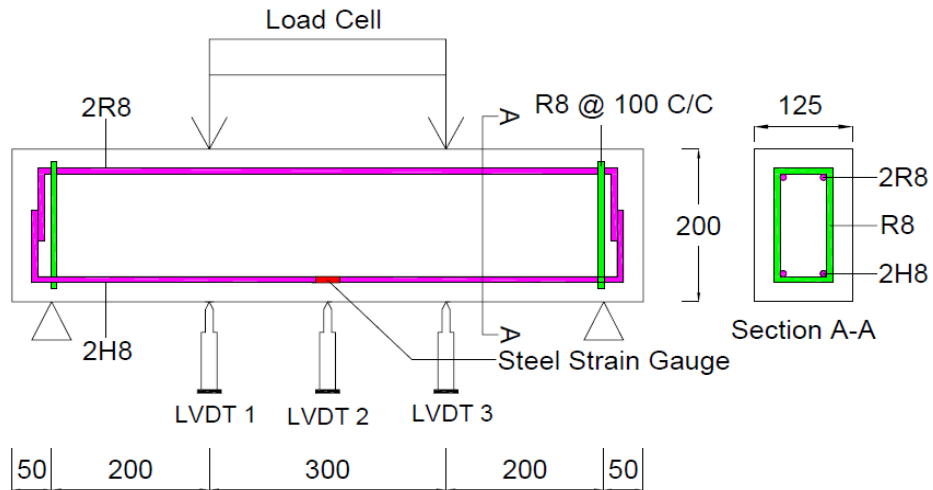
Detailing of NWRC-W/OS, SFRC-0.6 and SFRC-0.7 Beam (Note: all dimension in mm)
